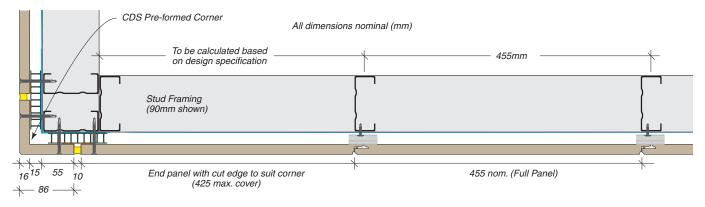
Typical Framing Set-Out with 75mm Steel Framing and CDS Pre-formed Corners - Plan View
